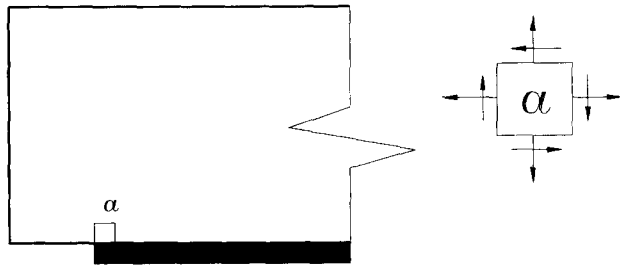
Stresses Acting on Concrete Beam at Cut-Off Point of FRP Plate
